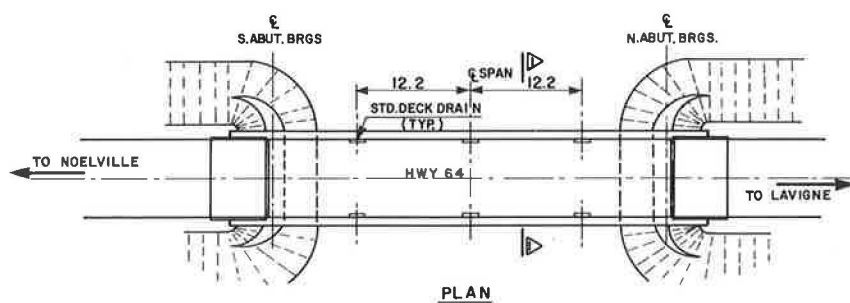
General layout of the West Arm Lake Nipissing Bridge.
